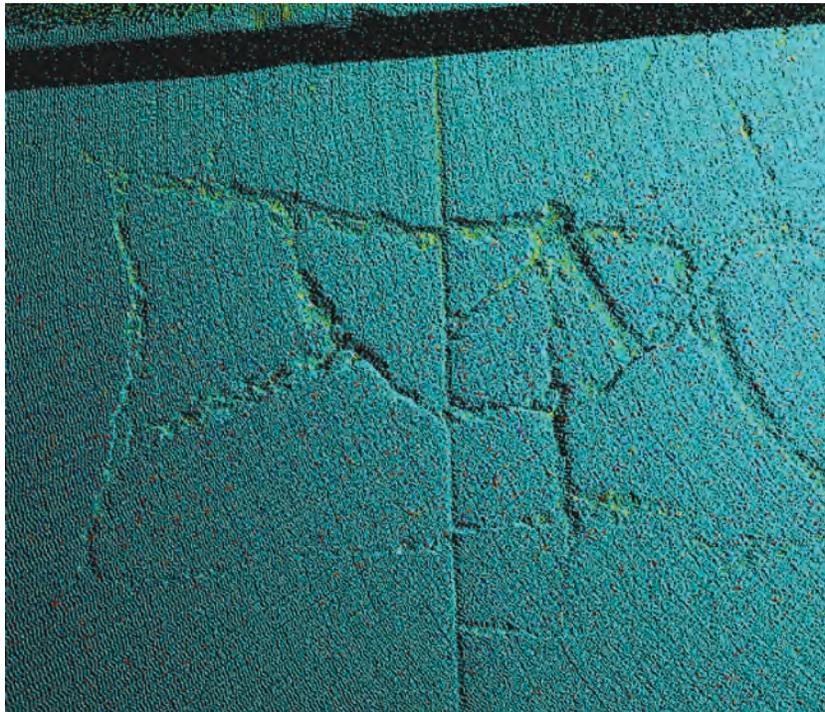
Intensity return used to highlight concrete cracking in a static scan (plan view).
